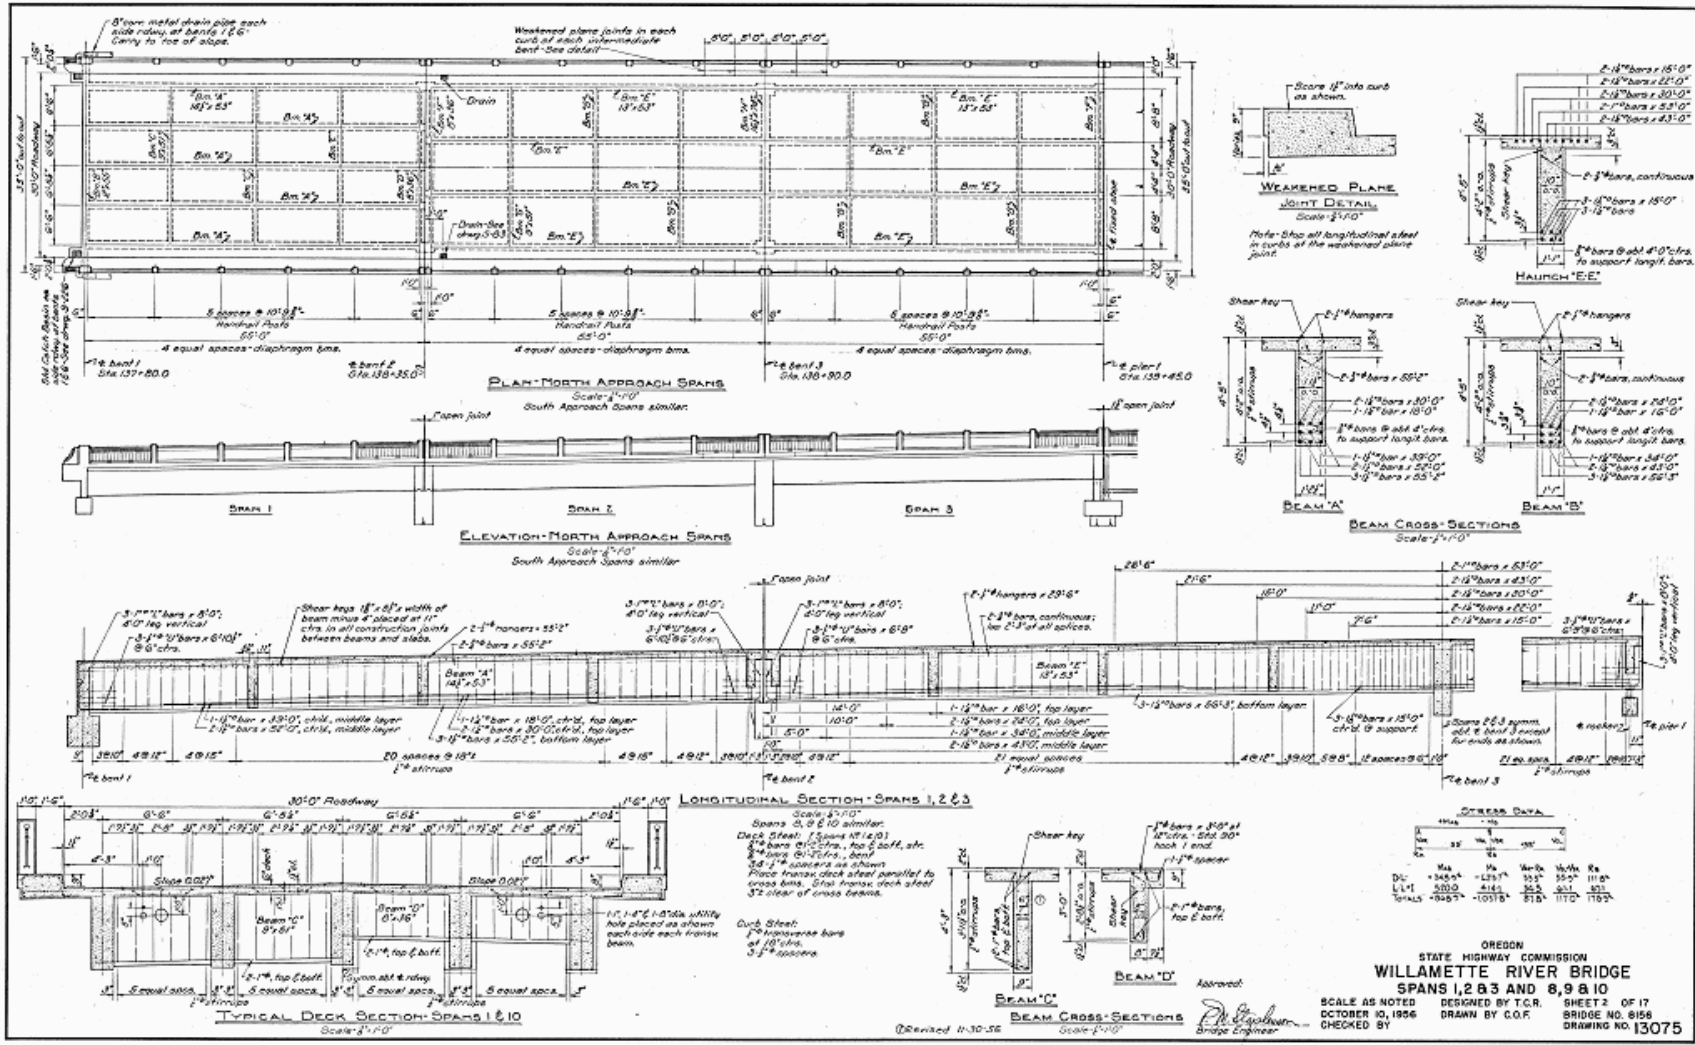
Plan view of Willamette River Bridge on OR 219
